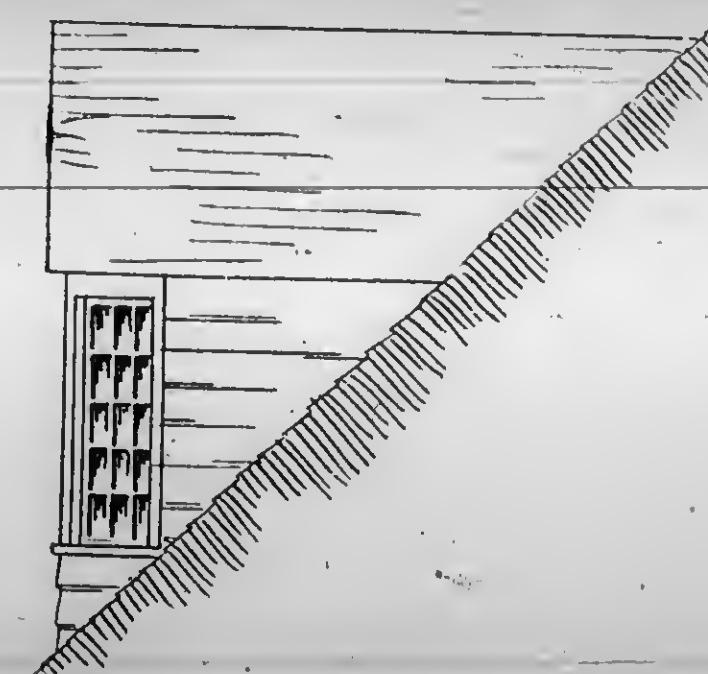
SIDE ELEVATION—DORMER WINDOW.
